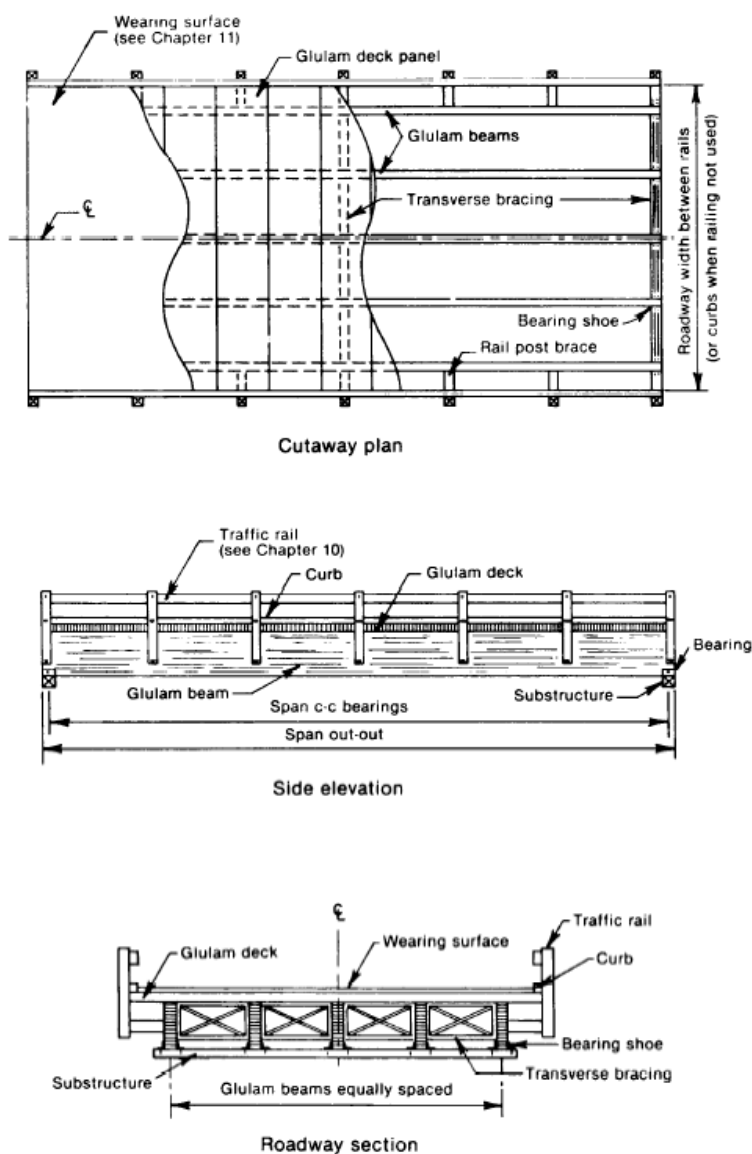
Typical glulam beam bridge configuration (Ritter, 1990)
